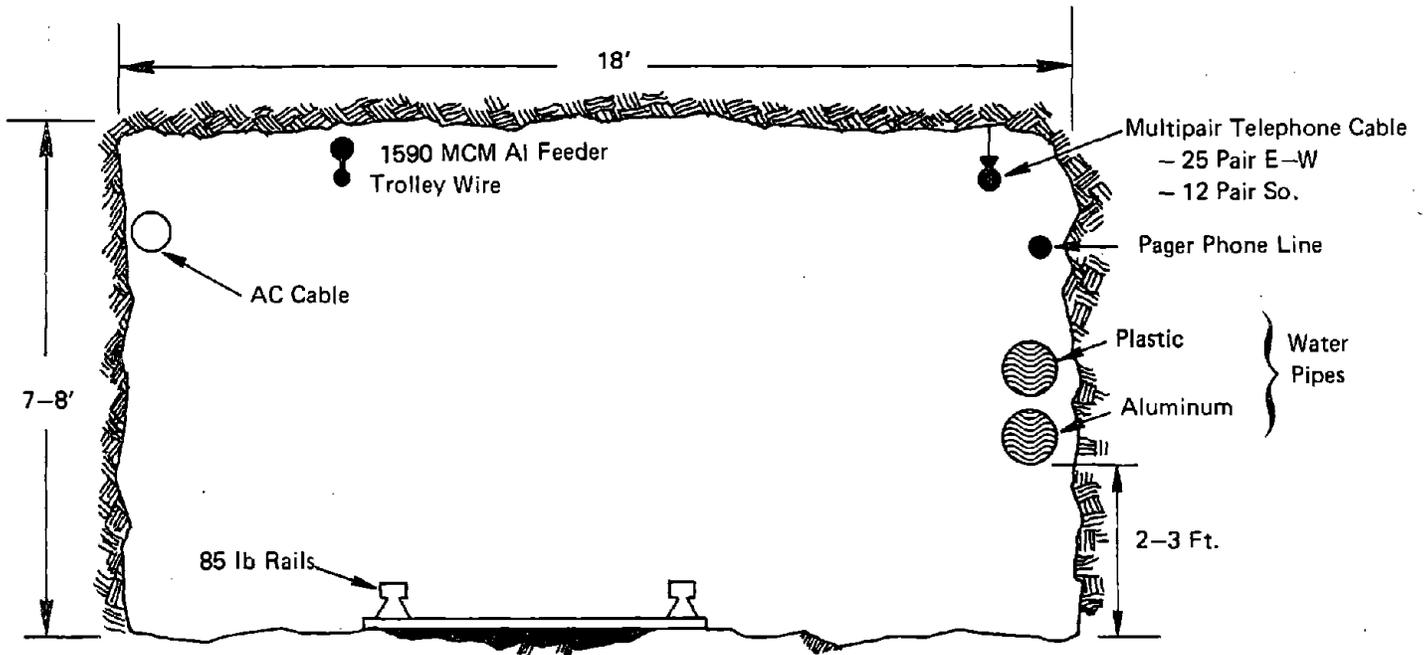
TYPICAL CROSS-SECTION - MAIN HAULAGEWAY
